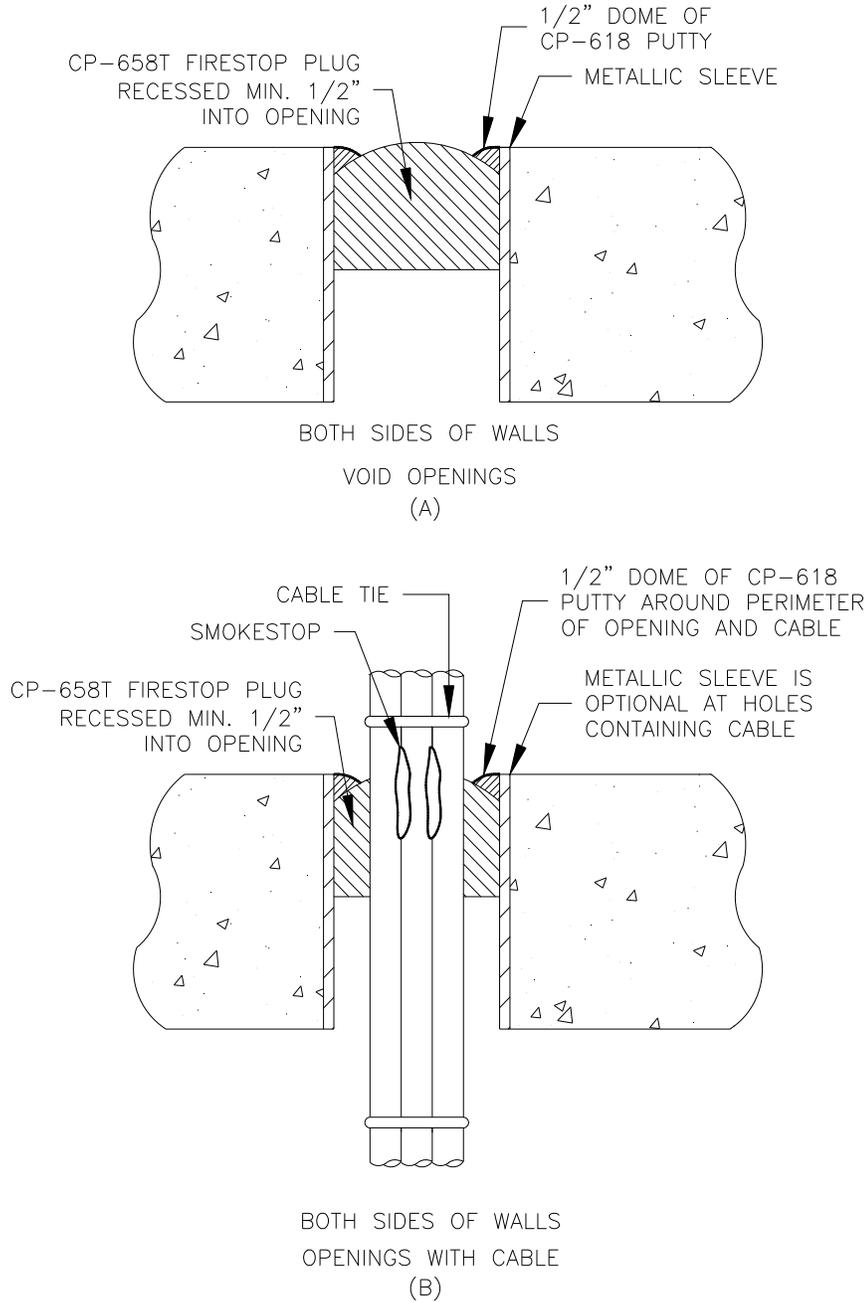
BUILDING SERVICES WALL OPENING FIRE STOPPING
